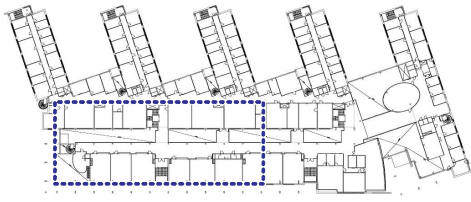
Second floor layout of the building used for the measurements. Measurement area is pointed out with the dotted line.
